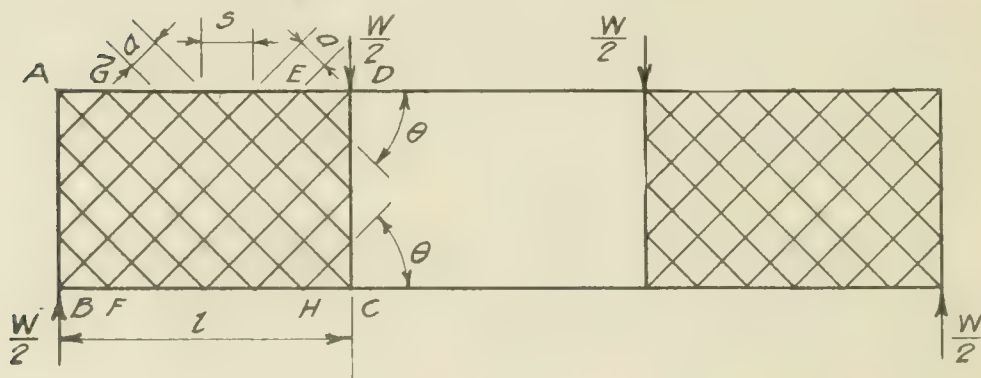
TRUSS-BEAM WITH DIAGONAL WEB MEMBERS.
